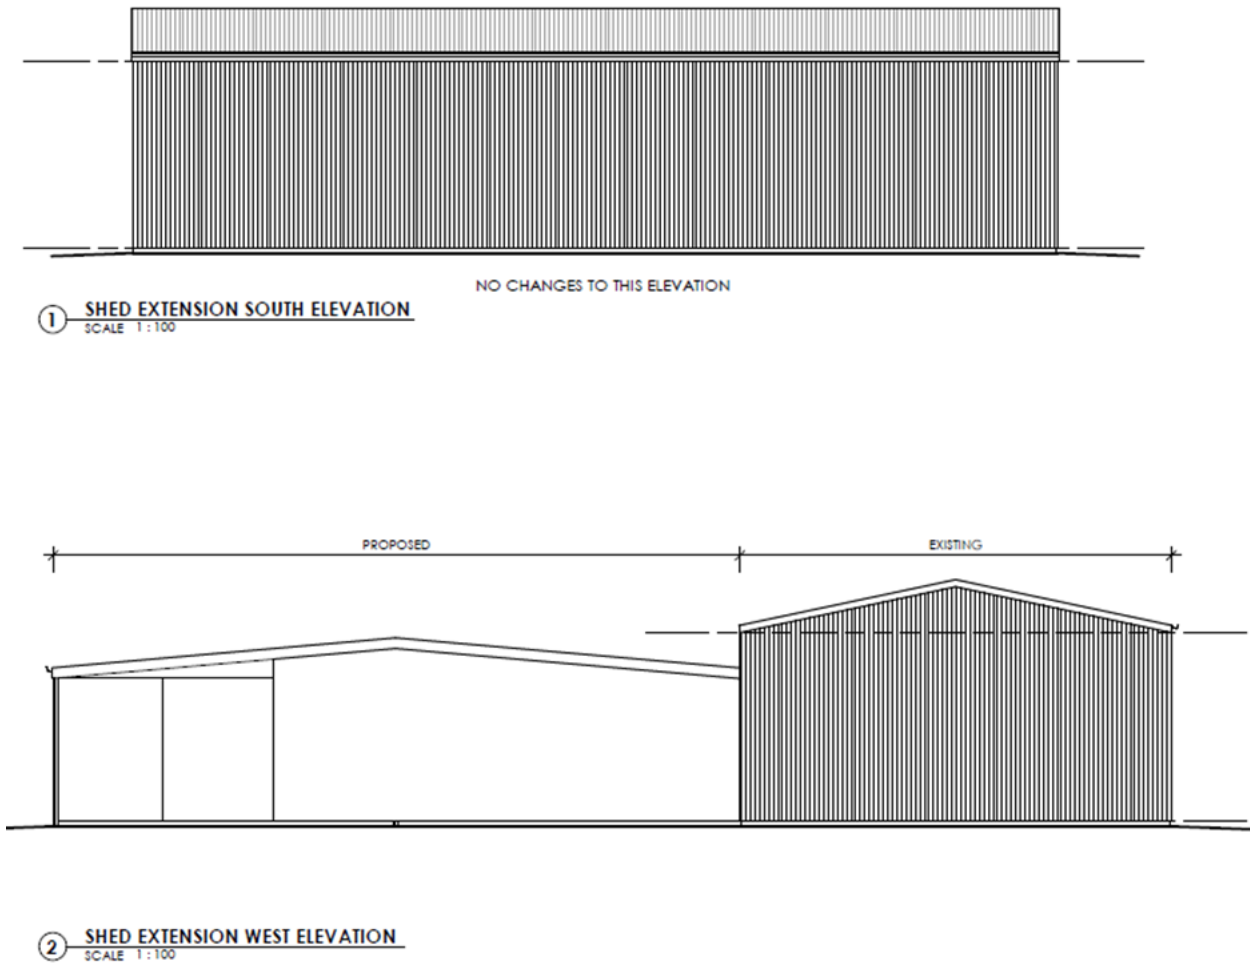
Proposed Existing Shed Extension Elevation Plan
